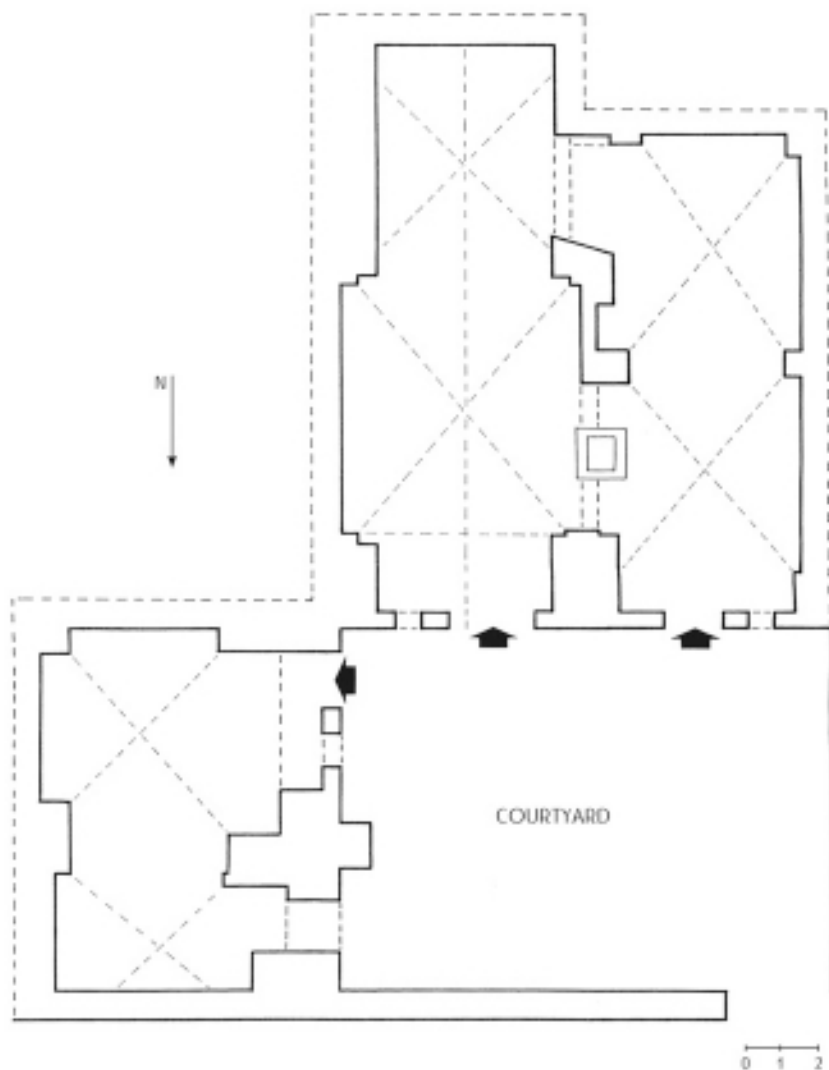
Plan of houses with attached courtyard, Pisan quarter, Acre (House 1:11) (drawing by author).
